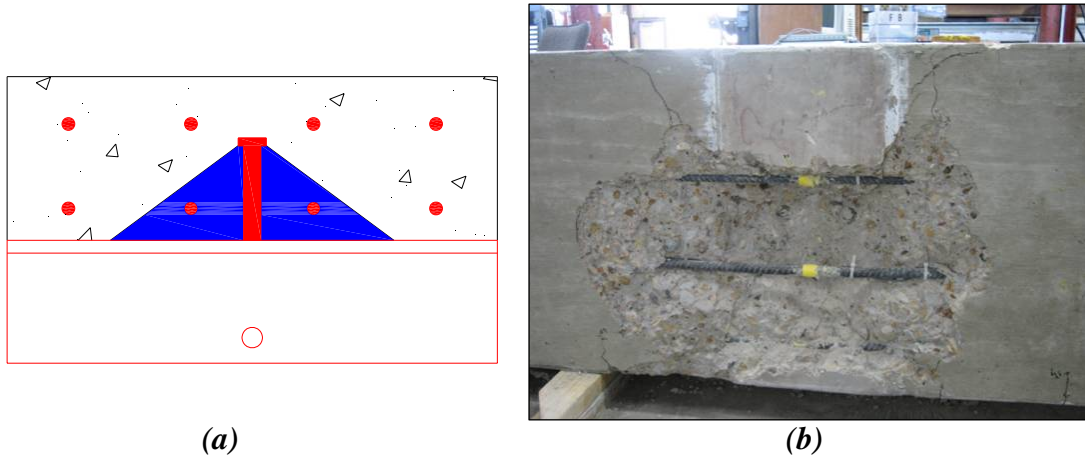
(a) Drawing and (b) photograph showing the center transverse bars running through the concrete failure prism for a specimen with no haunch
